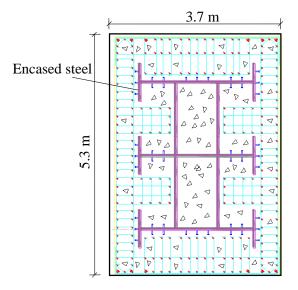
Steel skeleton section of super column for Shanghai Tower^[2]
